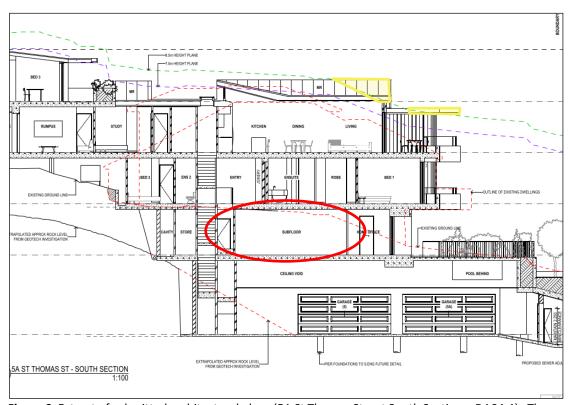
Extract of submitted architectural plans (5A St Thomas Street South Section – DA04.4). The area shaded yellow represents the height of building non-compliance. The area outlined in red demonstrates that a portion of the 'sub-floor' should be counted as GFA.
